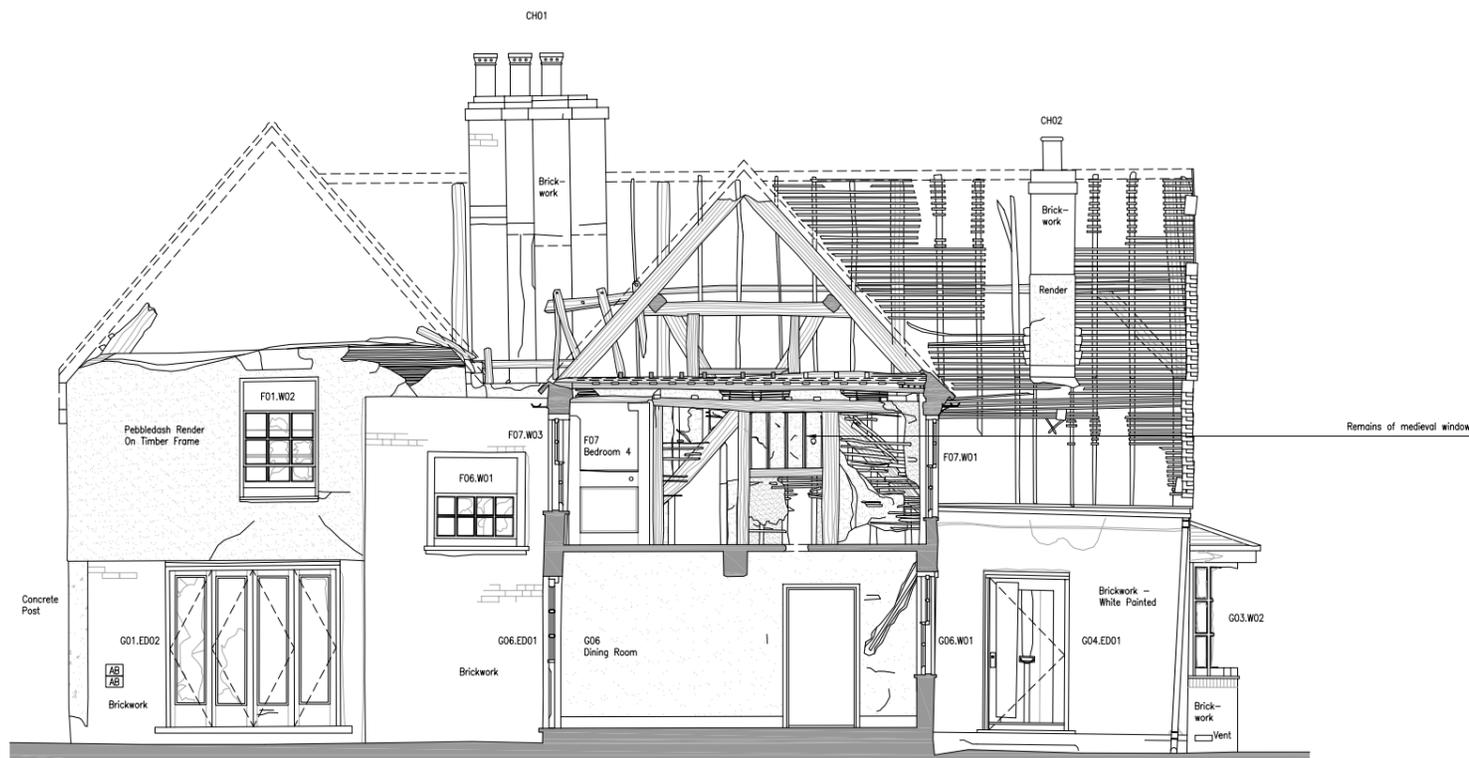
(NTS) Sample of existing plans and elevations - Existing Section A-A through fire damaged building
